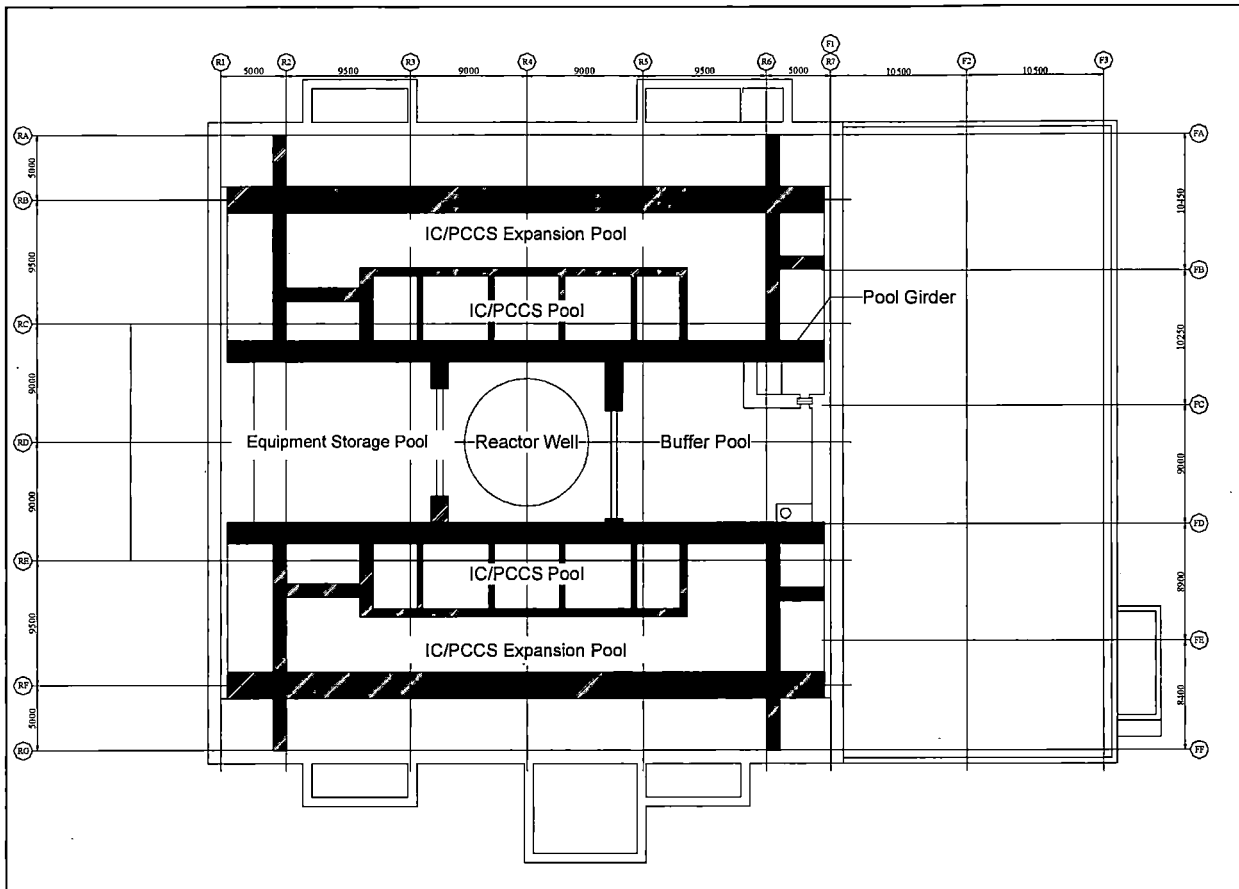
Modeled RB Pool Walls Except External Walls at EL 27,000
